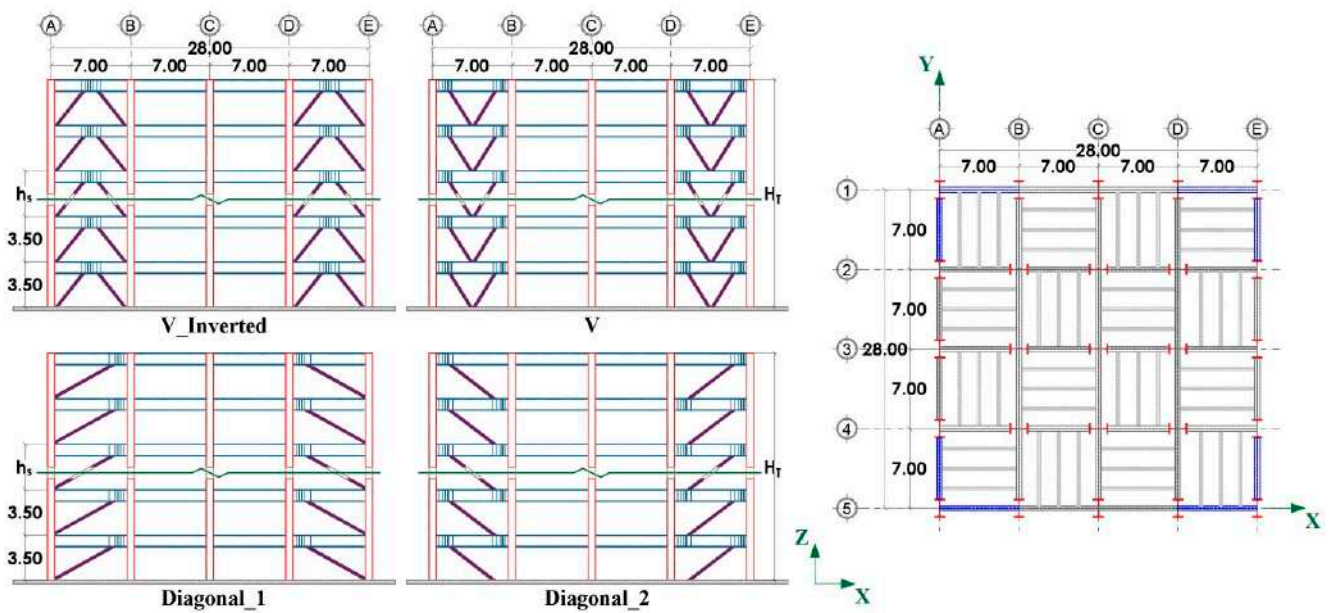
Elevation, plan, and element location for the five-level models (units in meters).
